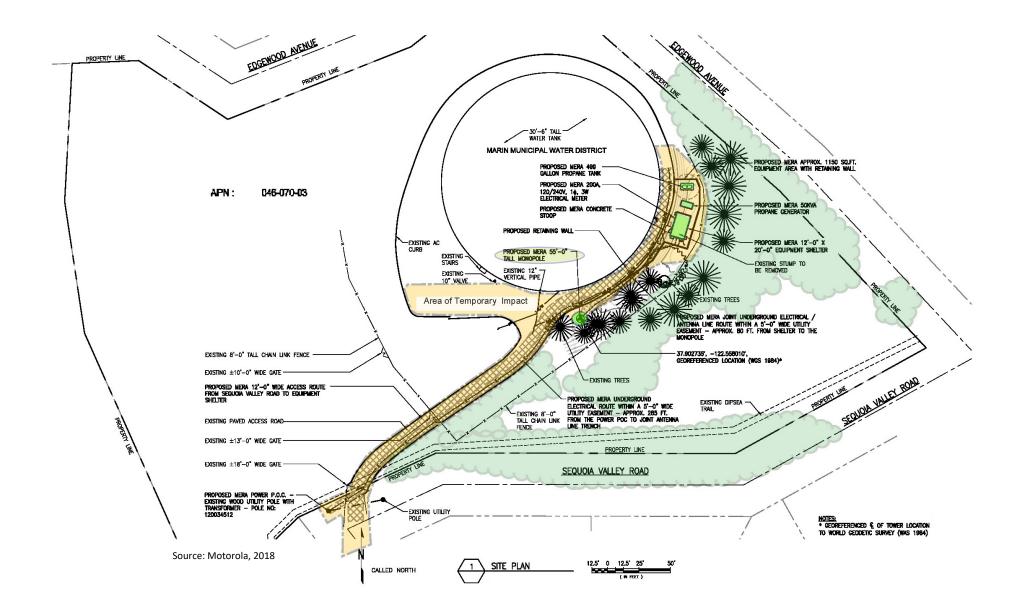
Site 26 - Mill Valley Water Tank Overall Site Plan
